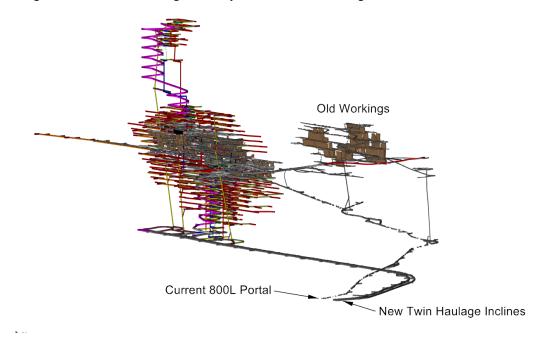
An Isometric View Looking Southwest of the Kainantu Underground Development Layout
